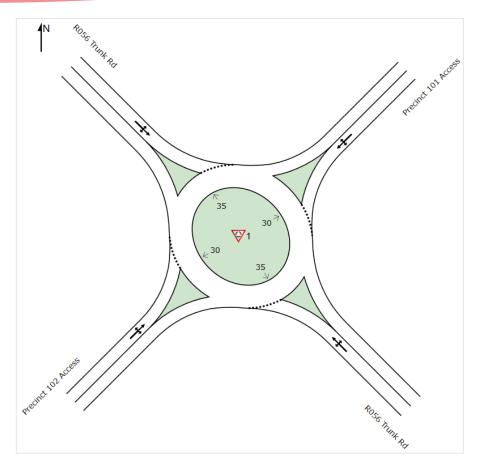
Intersection 1 SIDRA Intersection Layout
